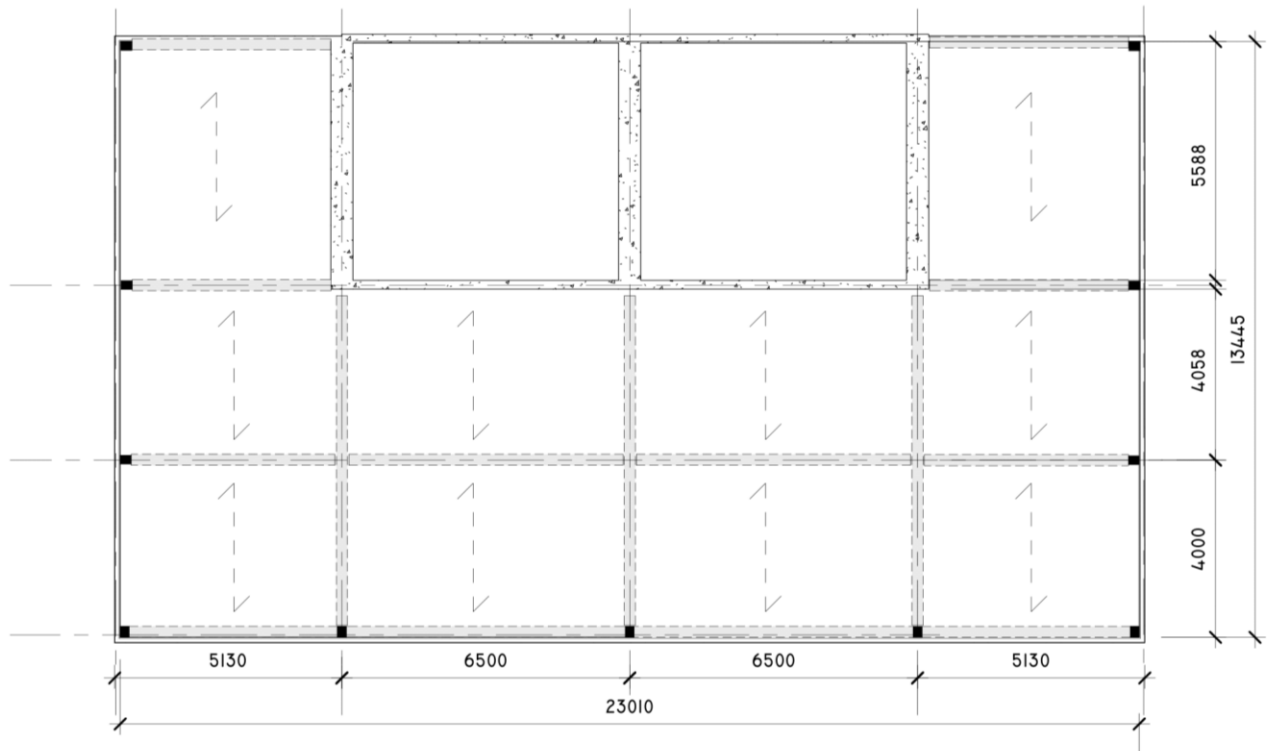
Concrete scheme, structural plan (NTS) resolved in RESIST. Authors own drawing.
